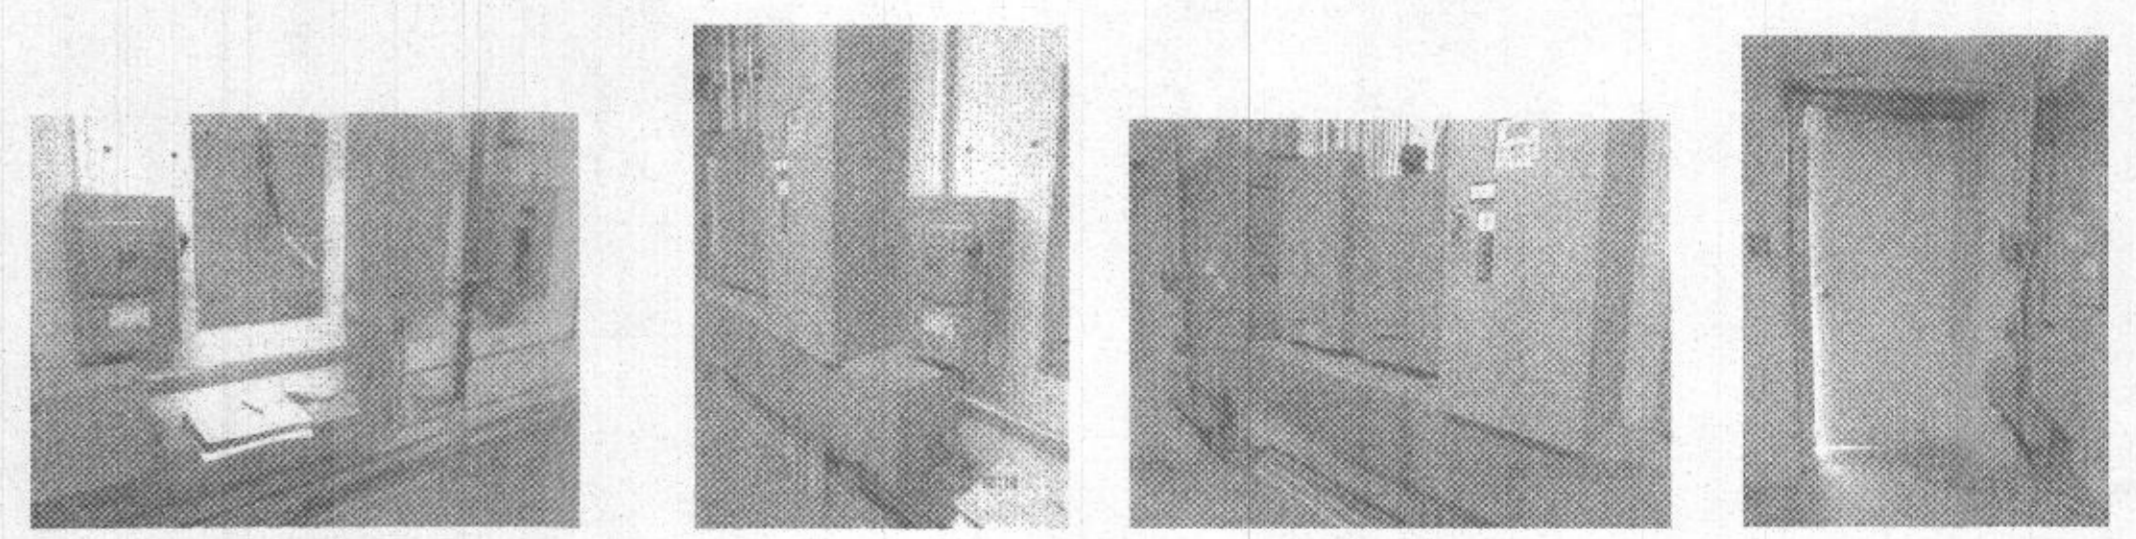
PHOTO #6 PHOTO #7 PHOTO #8
